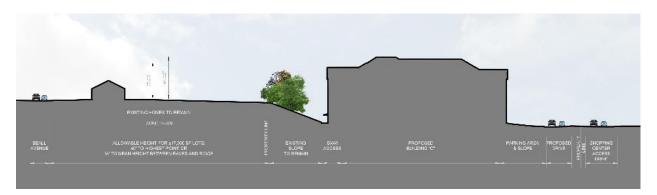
Section thru Buildings A and B showing a drop in elevation, and a buffer of trees between the Subject Property and the adjacent residential properties on Beall Avenue
